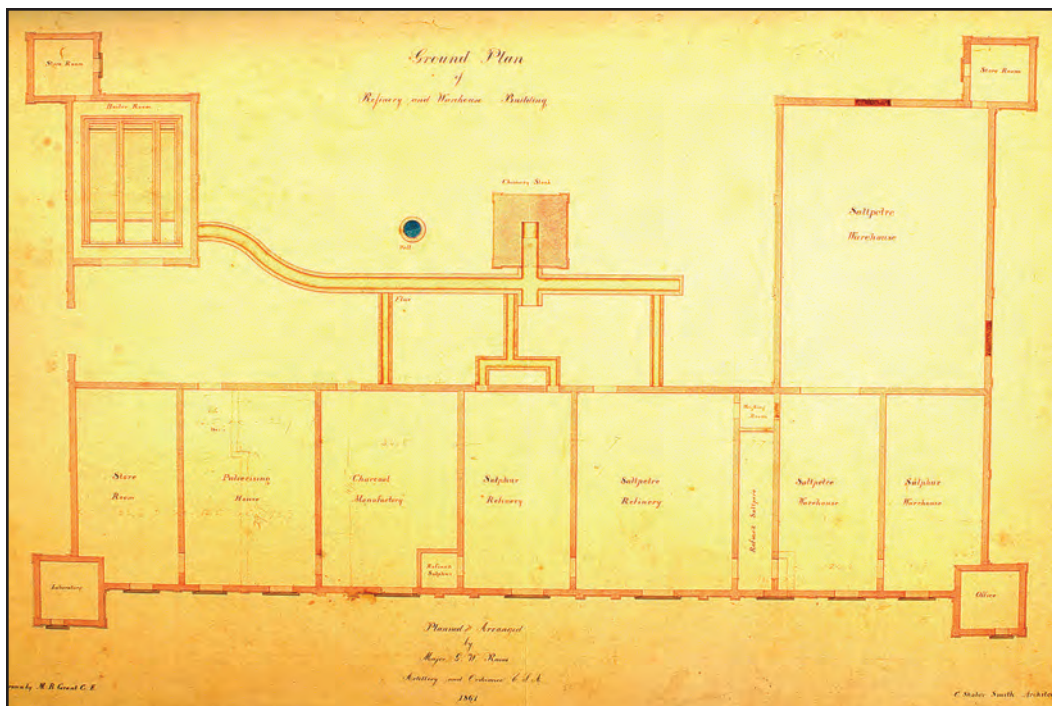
Ground plan of the refinery and warehouse. (Blanchard Family Collection)
